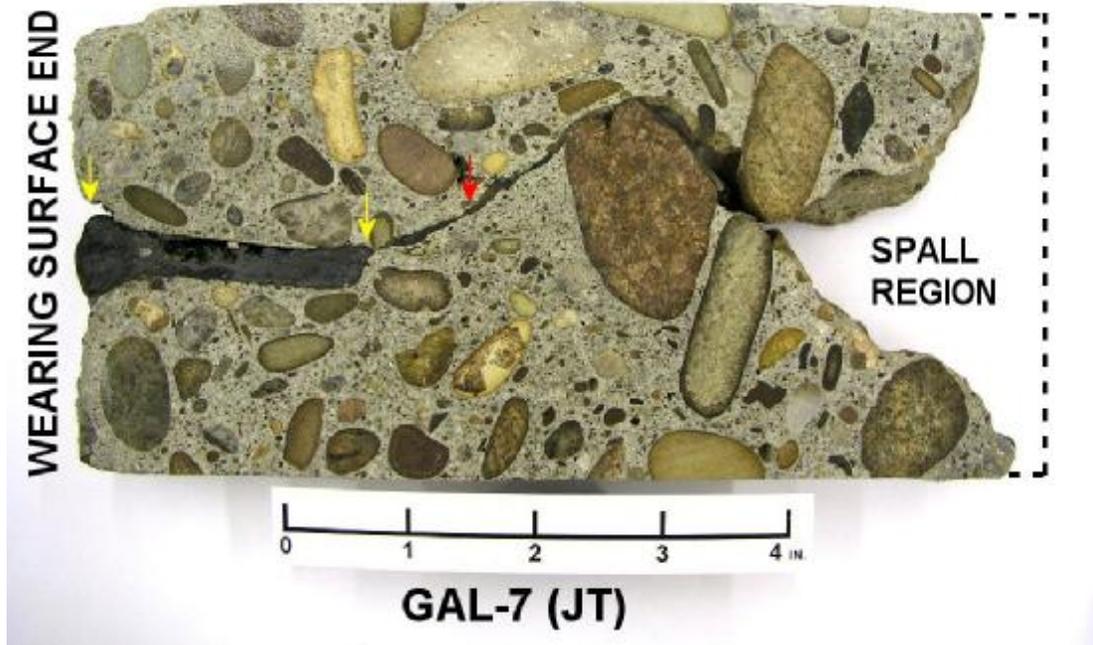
Lapped surface of Joint Core GAL-7 (JT).
